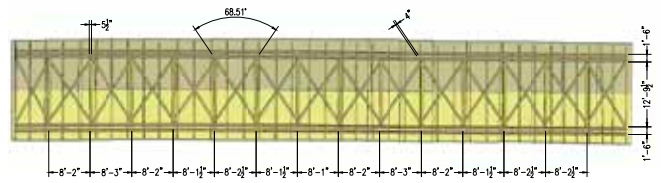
CAD dimensions of ceiling structure of the Cedarburg Bridge (UMD NRRI).
